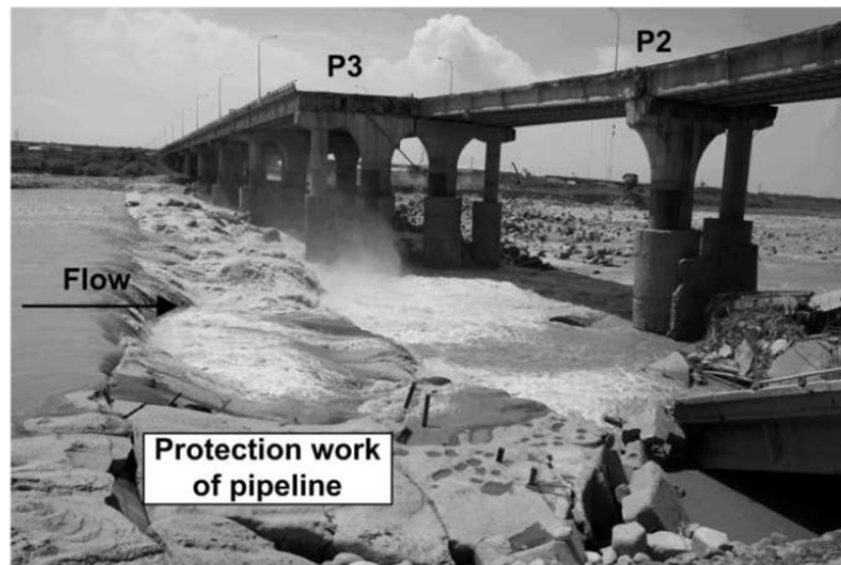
Partial Collapse of Houfeng Bridge due to Scour
